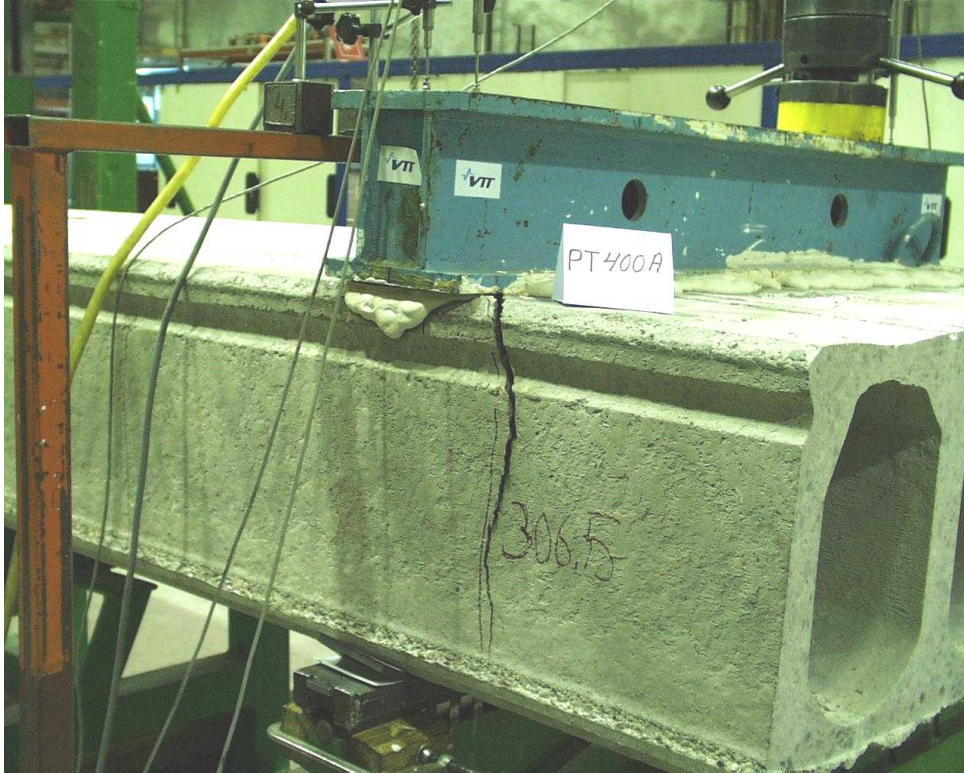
PT400A. Vertical crack outside the spreader beam.
